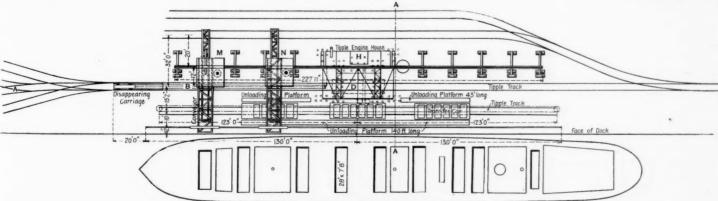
Plan of Brown Coal Hoisting and Conveying Plant.
